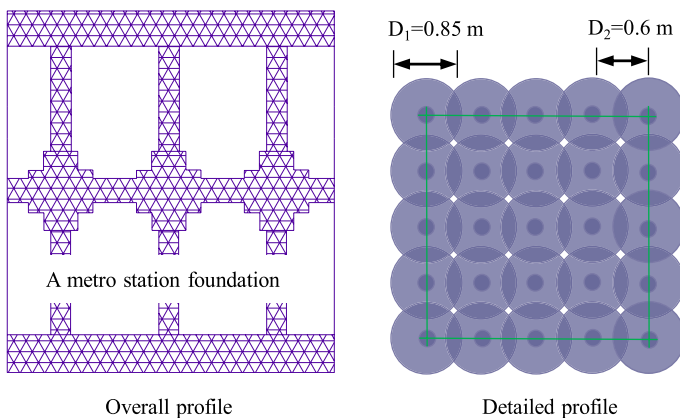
Basement reinforcement by jet-grouting pile in metro station. *Note:* D_1 is pile diameter and D_2 is pile space. After Liu (2018)
